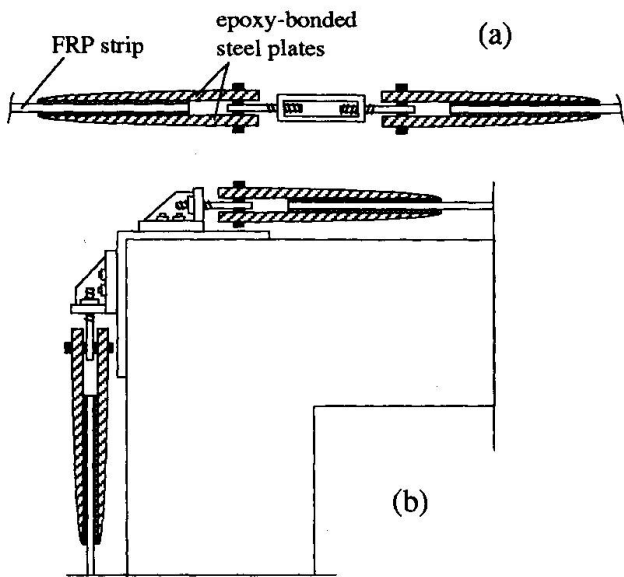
Conceptual FRP anchorage/attachment for (a) circumferential prestressing of circular domes; and (b) masonry structure corners.
